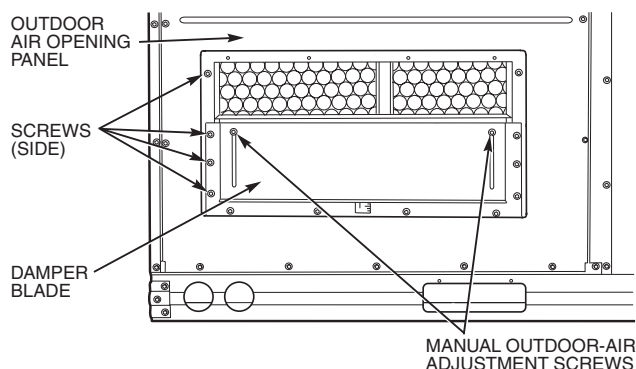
Damper Panel with Manual Outdoor-Air Damper Installed
